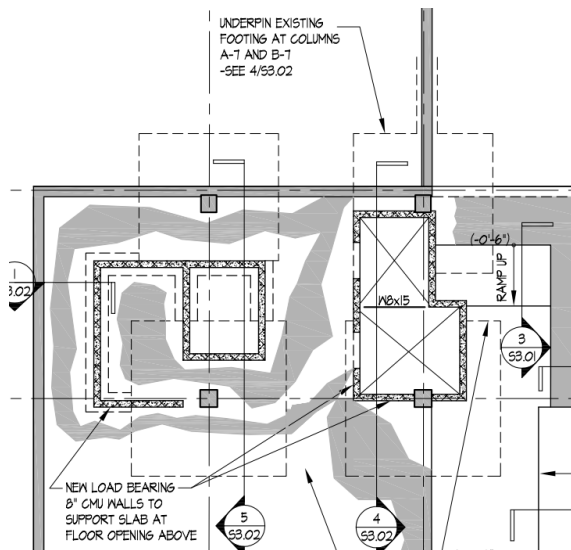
Location of new elevator pit and foundation underpinning shown in plan, S1.01
